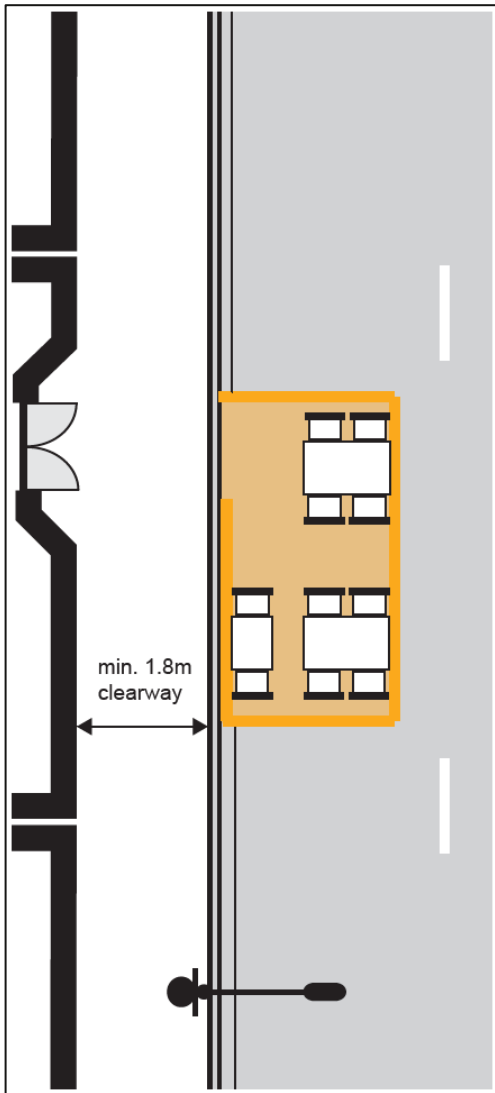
Patio in On-Street Parking Space<sup>5</sup>
